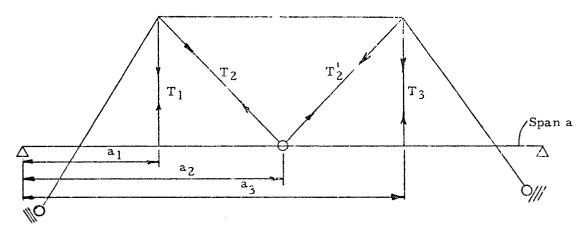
FRAME BRIDGE WITH HINGE, ELEVATION VIEW
